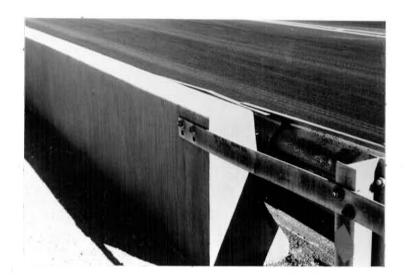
TREND Backstrap Attachment to Concrete Parapet Wall.
